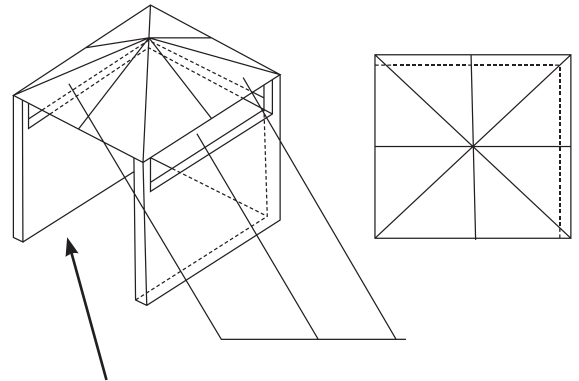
OUTDOOR AREA – EXAMPLE 2
